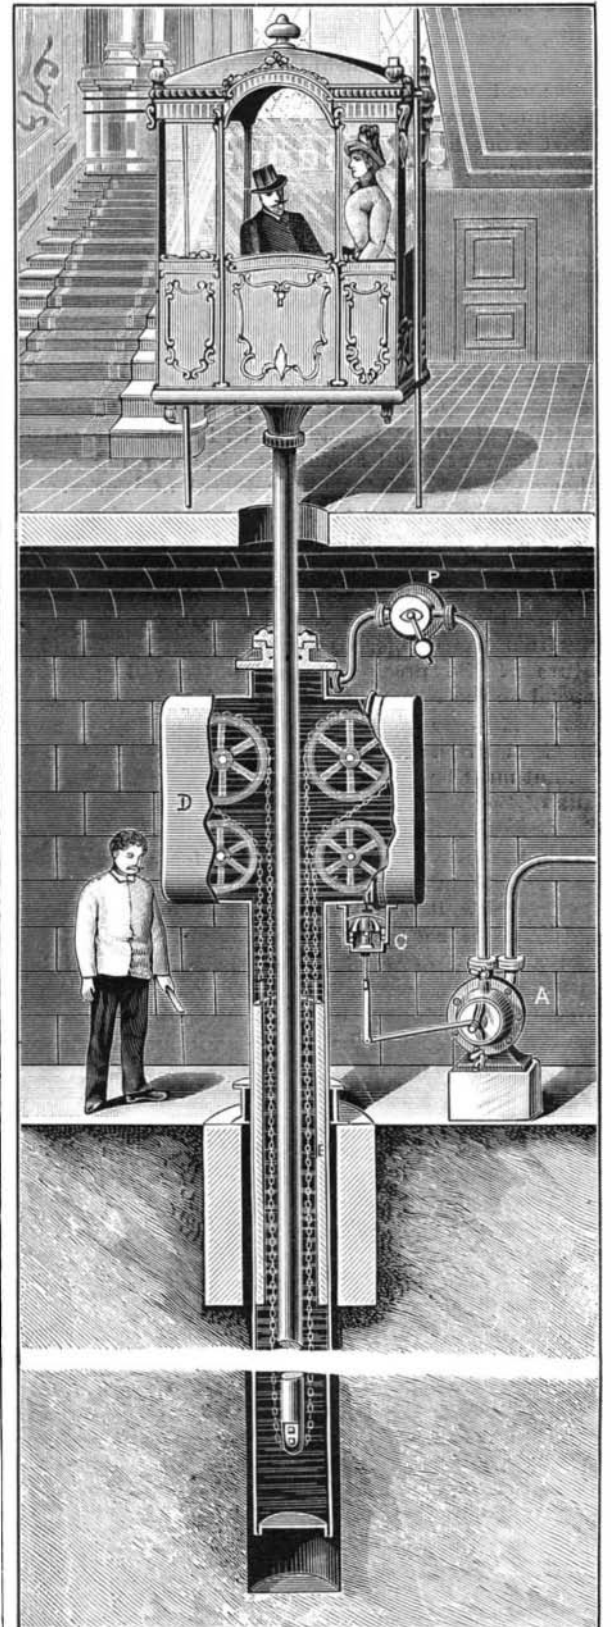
GENERAL VIEW OF THE NEW EDOUX ELEVATOR.
